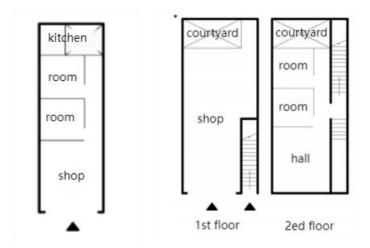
Building types of ground floor shops (left: shop in front and house in the back; right: shop below and house above)
